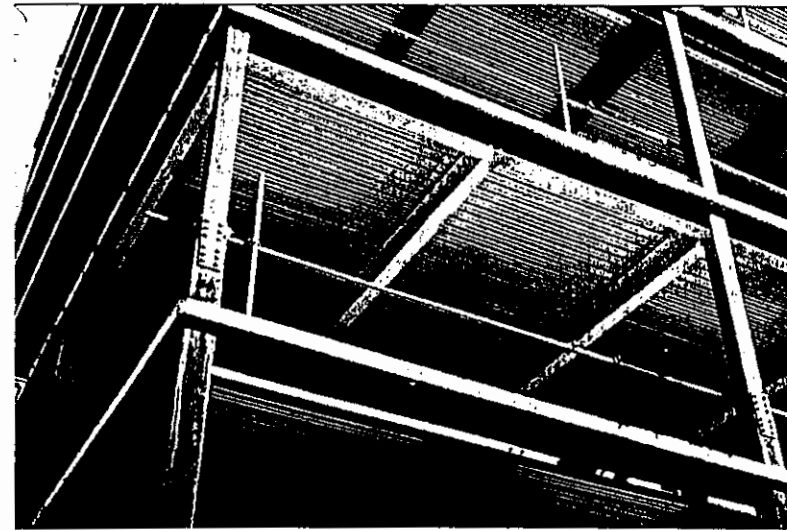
Typical arrangement of beams and columns in a multistorey building.
